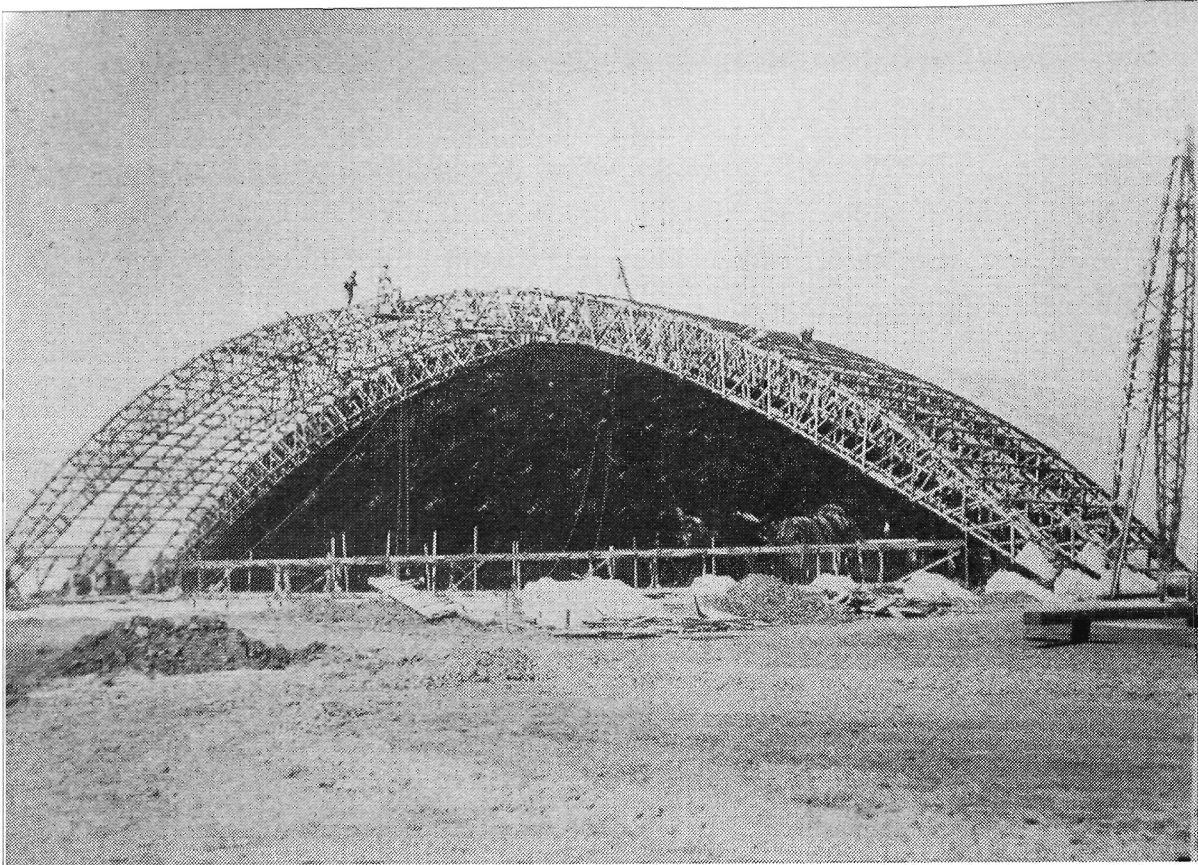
ANA igloo hangar under construction on 5 May 1944. The pylon crane was used to hold the half trusses in place until permanently fixed by the crown pin. Aircraft maintenance work was conducted even as the hangar was constructed.
